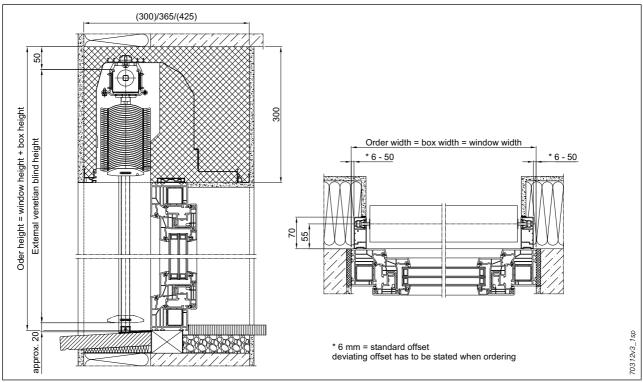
Ordering/measuring instructions for top-mounted ext. ven. blind for new buildings NA-RA M with E 80 A6 S in 120 mm shaft
